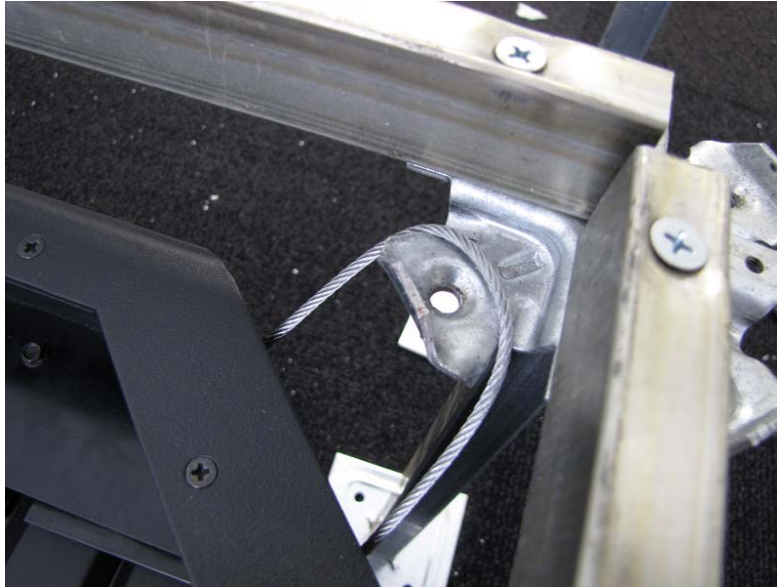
Insert hanger into roll form opening and catch the top angle inside the stringer
